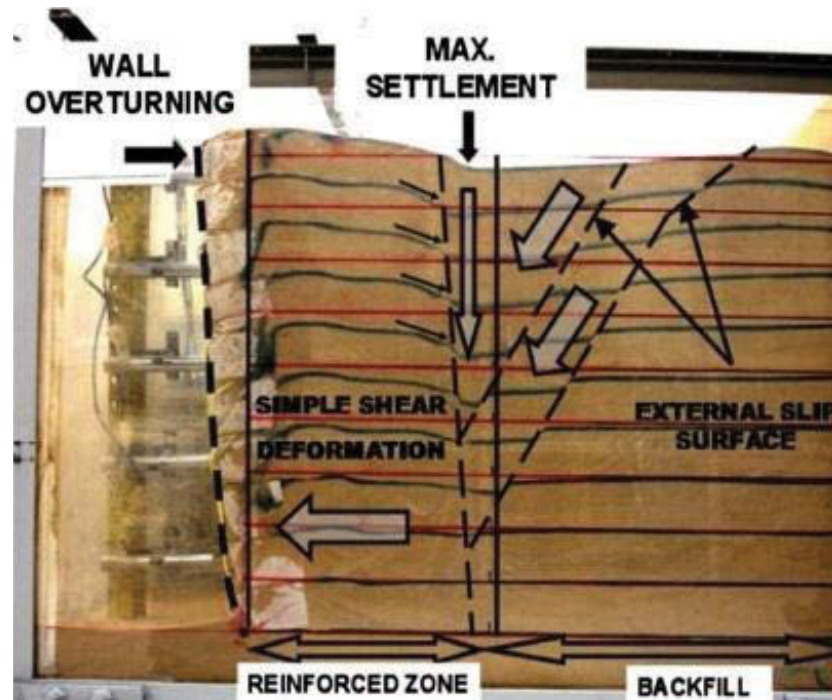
Details of the overturning mode and the failure mechanism (Sabermahani, Ghalandarzadeh & Fakher 2009)
